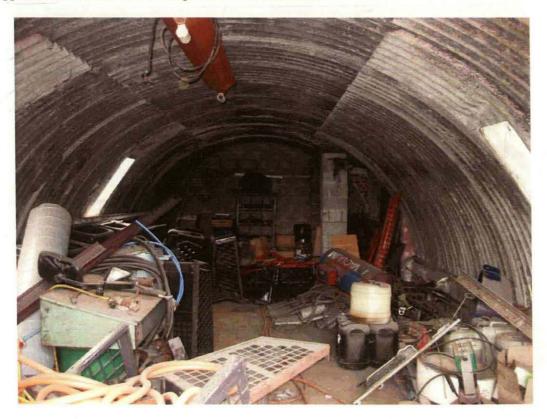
Interior of Room 2 of Nissen hut, view toward dividing wall, looking west
